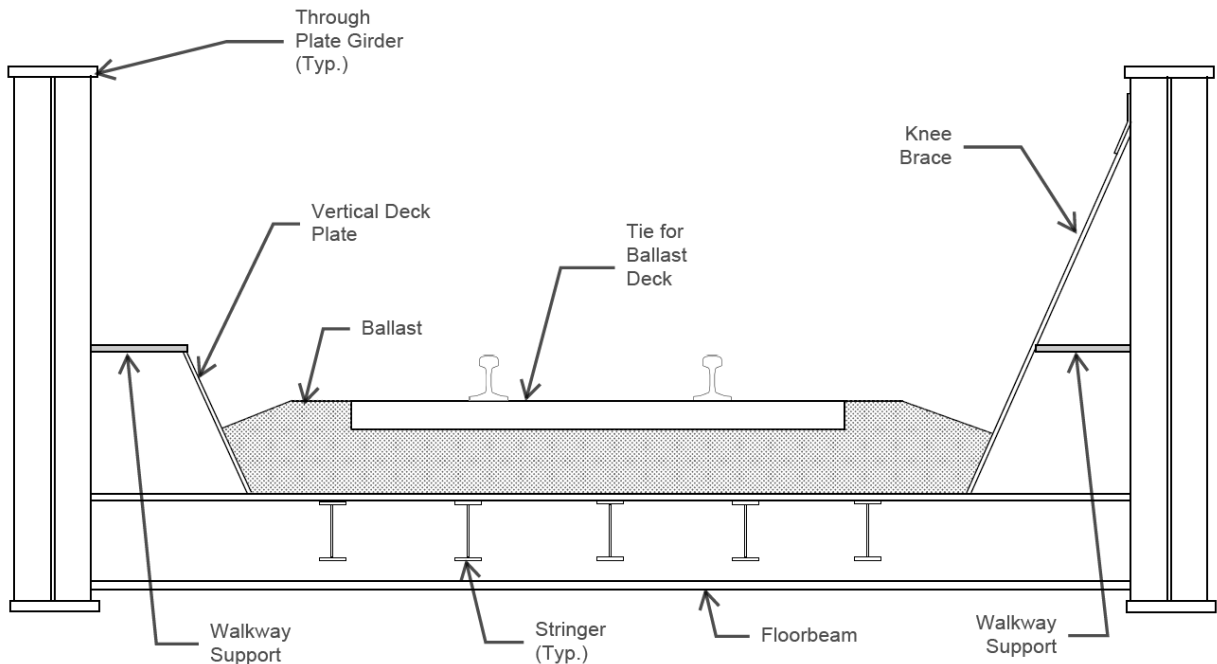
(a) – Through Girders with Ballast Deck and Stringers
